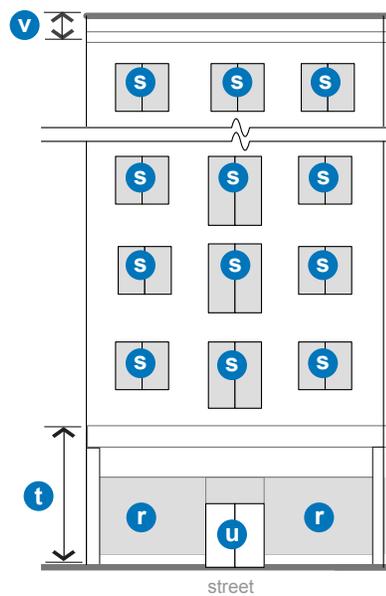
(3). Storefront Building: Street Facade Requirements.
